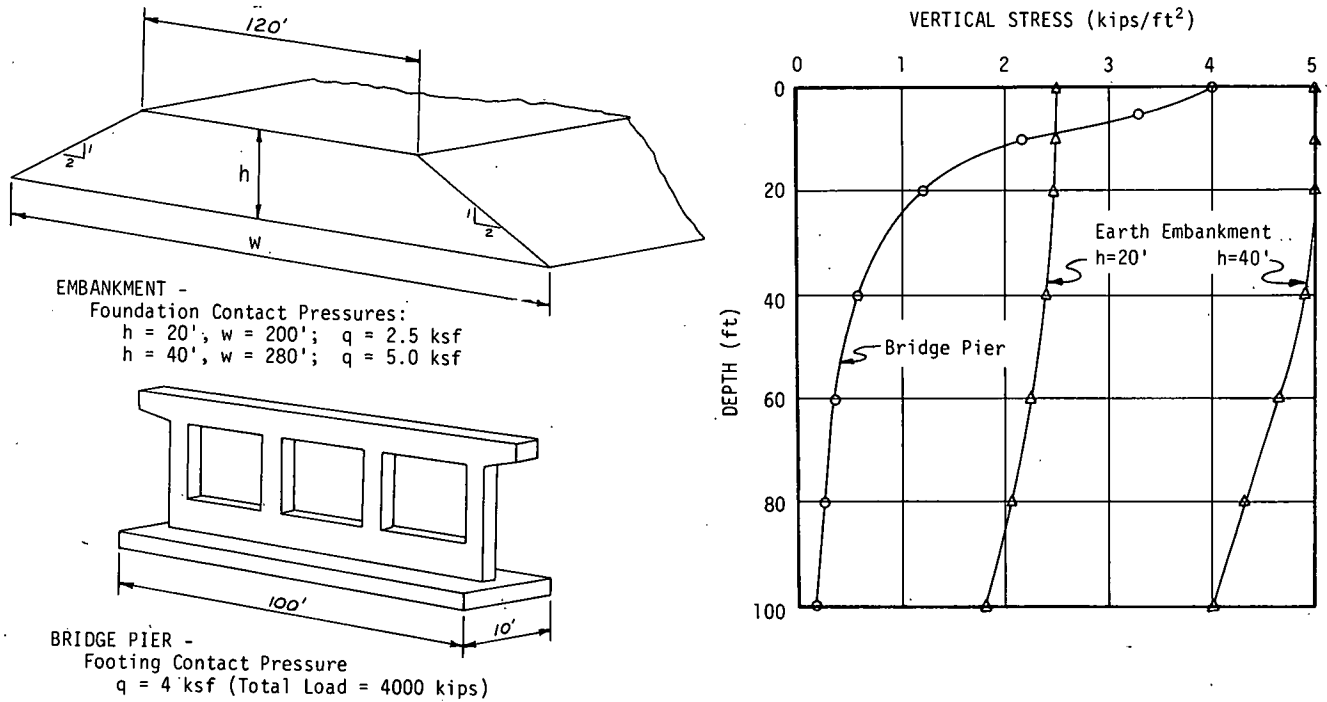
Comparison of vertical stresses beneath center lines of bridge pier and earth embankments.
